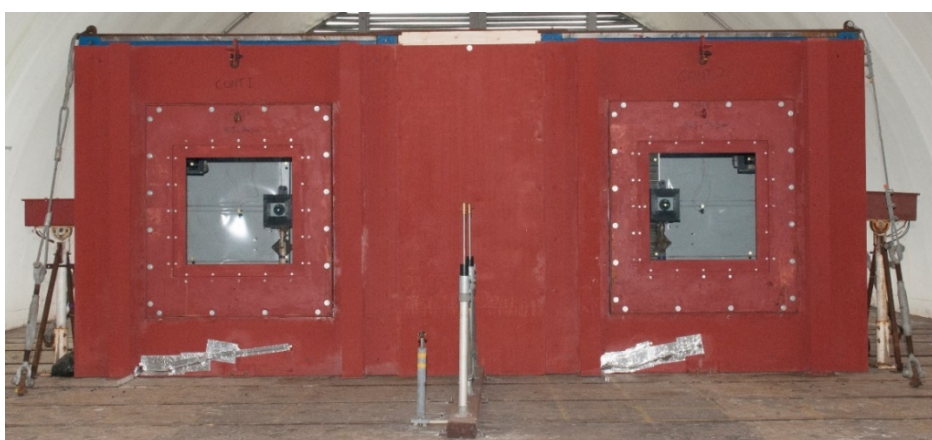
Front elevation (photograph) of test cubicles. View towards ABT RWE.
